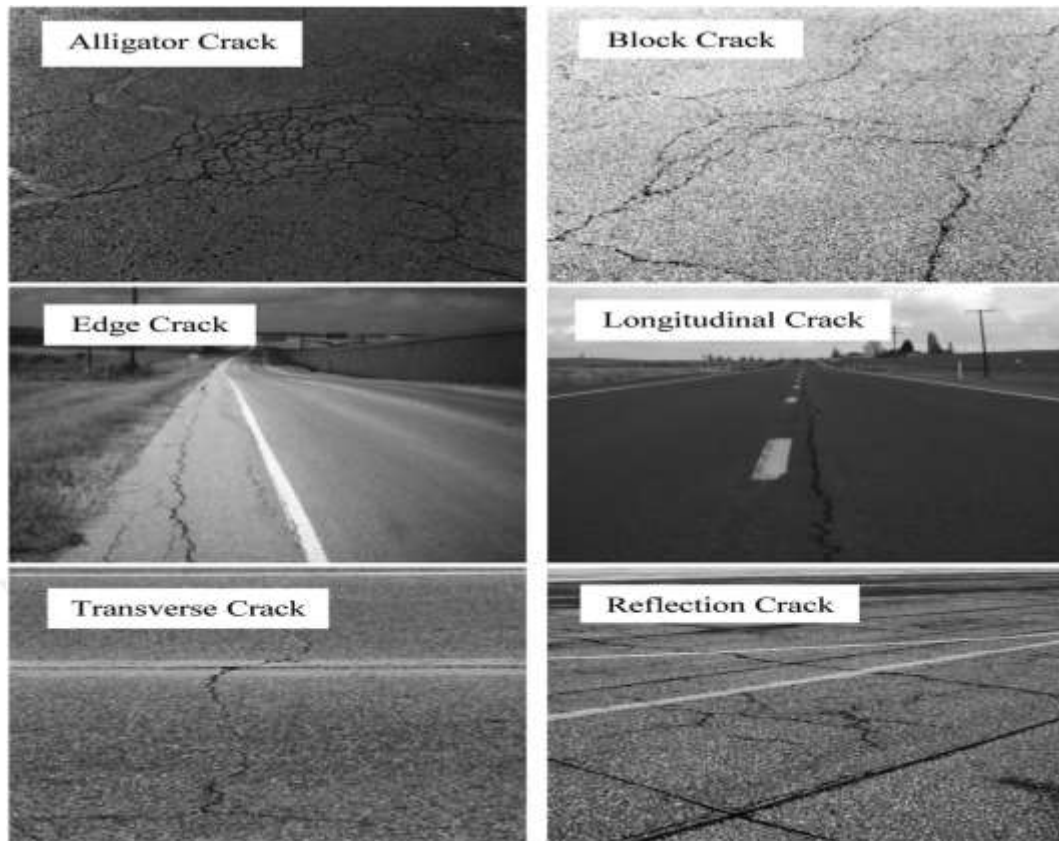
Examples of Asphalt Pavement Crack.
